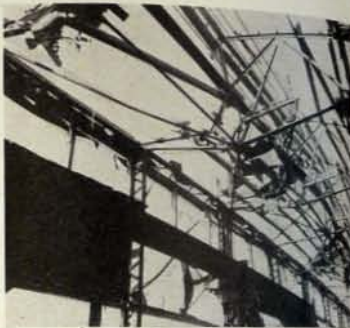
5,000 feet from GZ. Group 36, Building 8. Typical roof failure.
